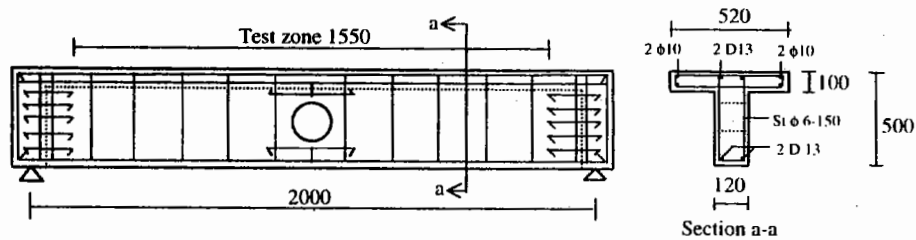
Test zone and reinforcement arrangement of the beam (in mm)
